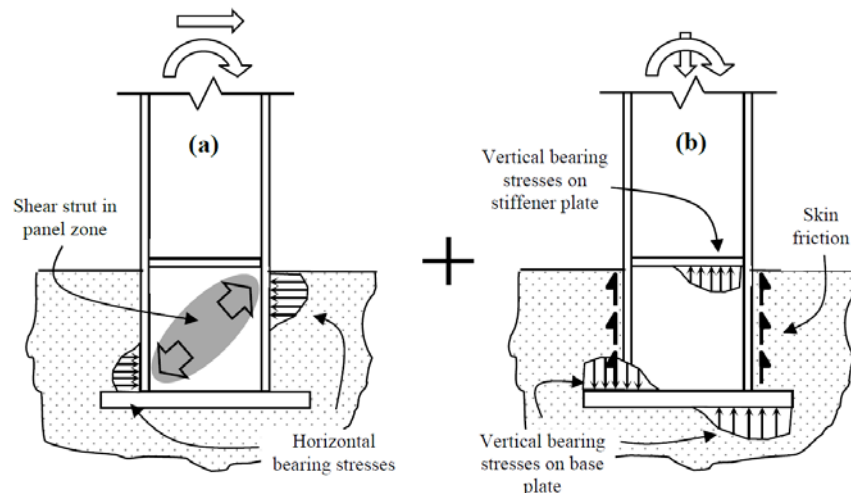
Force resisting mechanisms (a) horizontal bearing and panel zone strut (b) vertical bearing and skin friction
